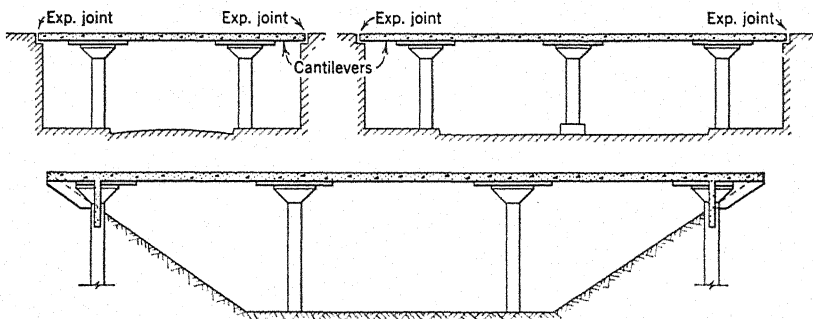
Longitudinal Sections of Flat-Slab Bridges. (See p. 328.)
